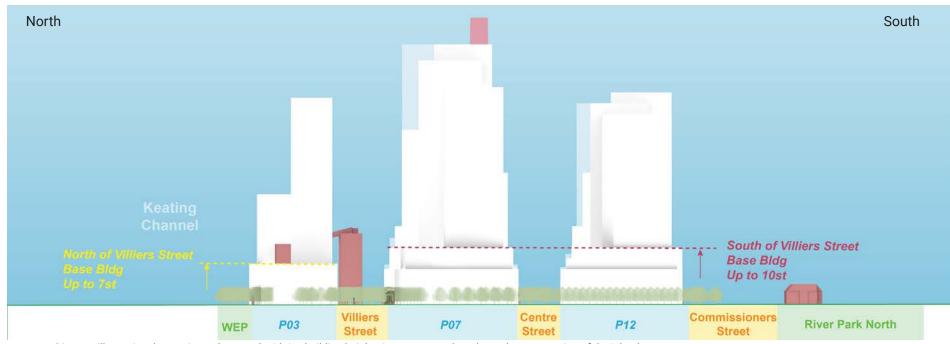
Diagram illustrating the maximum base and mid-rise building heights in a conceptual north-south cross section of the Island
